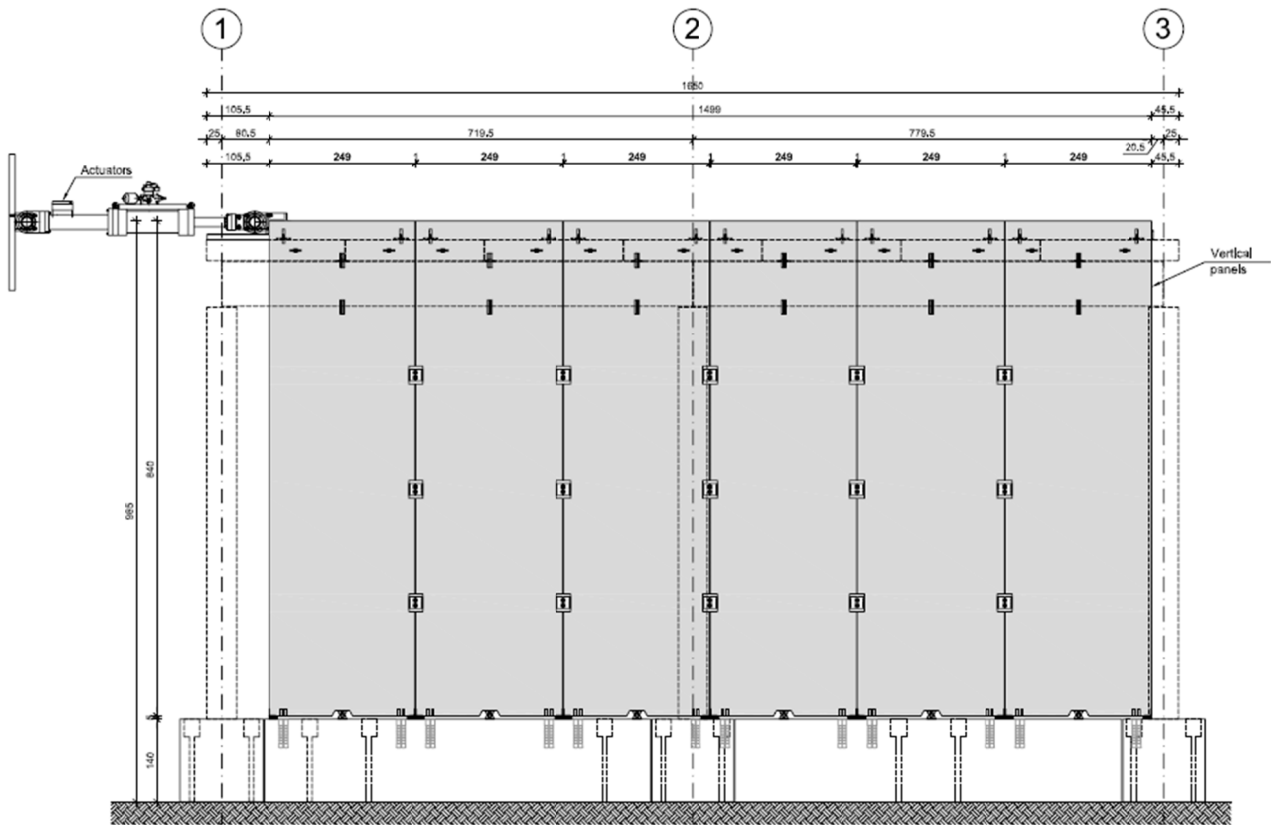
Prototype with vertical panels: elevation longitudinal view
